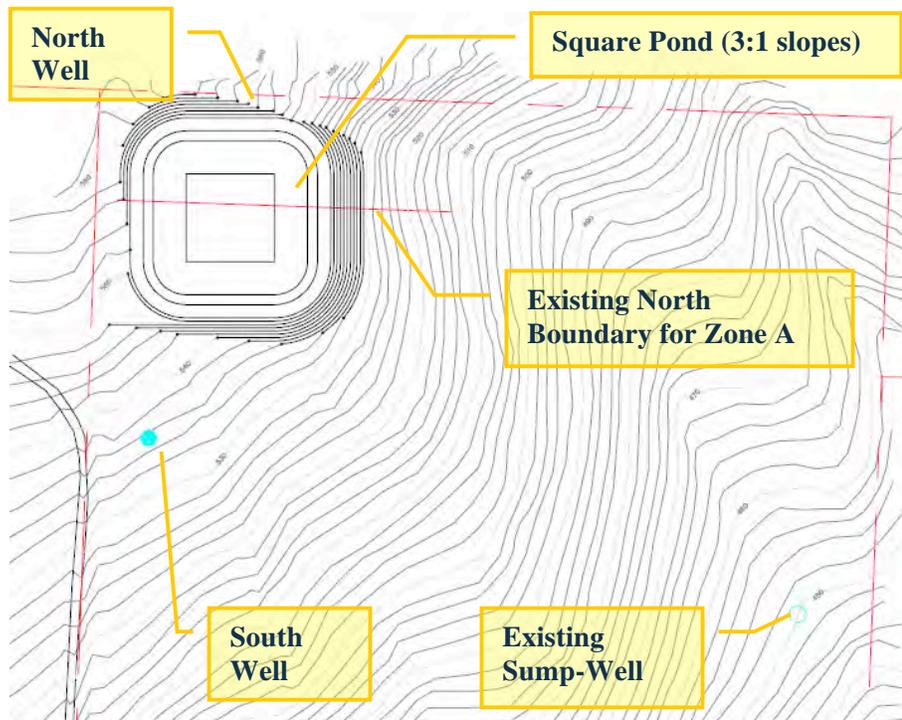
Storage Pond at Highest Point (NW Corner). Square Pond with 3:1 Slopes Encroaches 150' Into Existing Orchard Zone A.
